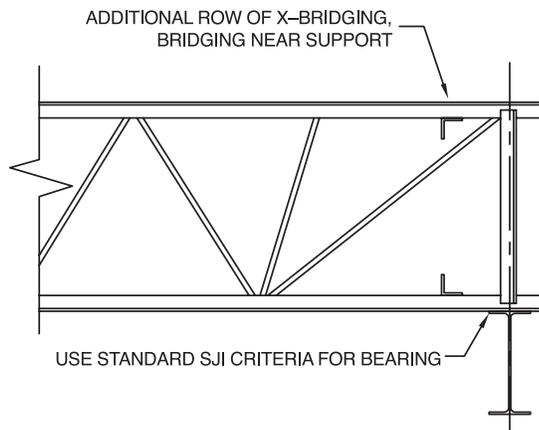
SQUARE ENDED, BOTTOM BEARING
